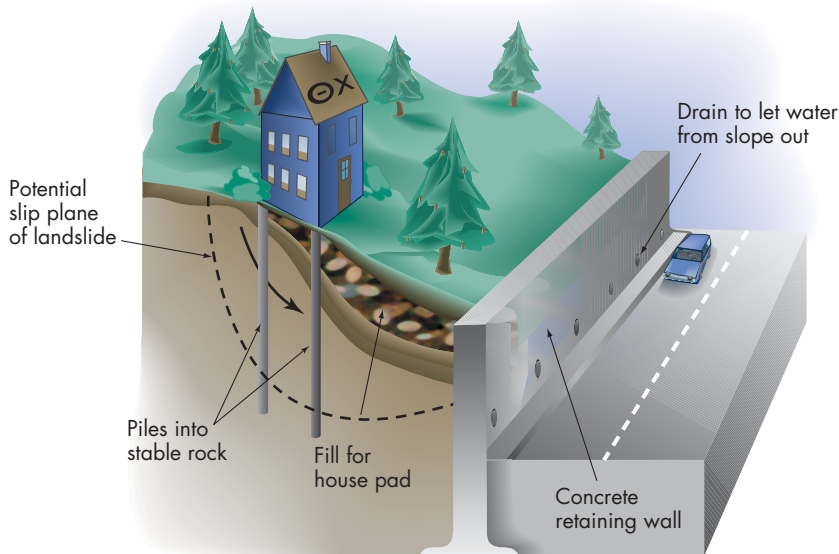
How to support a slope Some types of slope support: retaining walls, piles, and drains.
